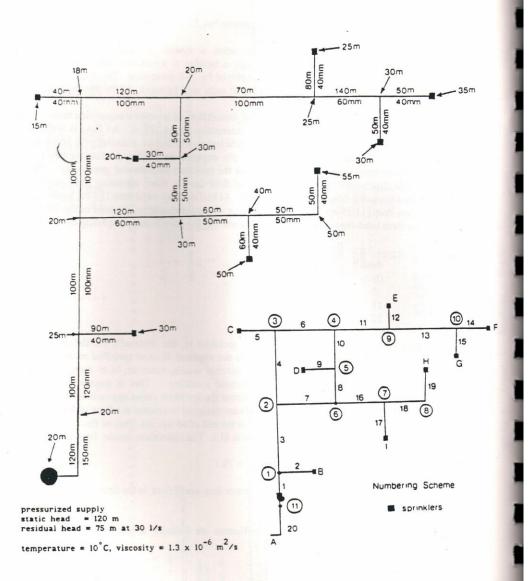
Example 3 - Twenty Pipe Sprinkler System
